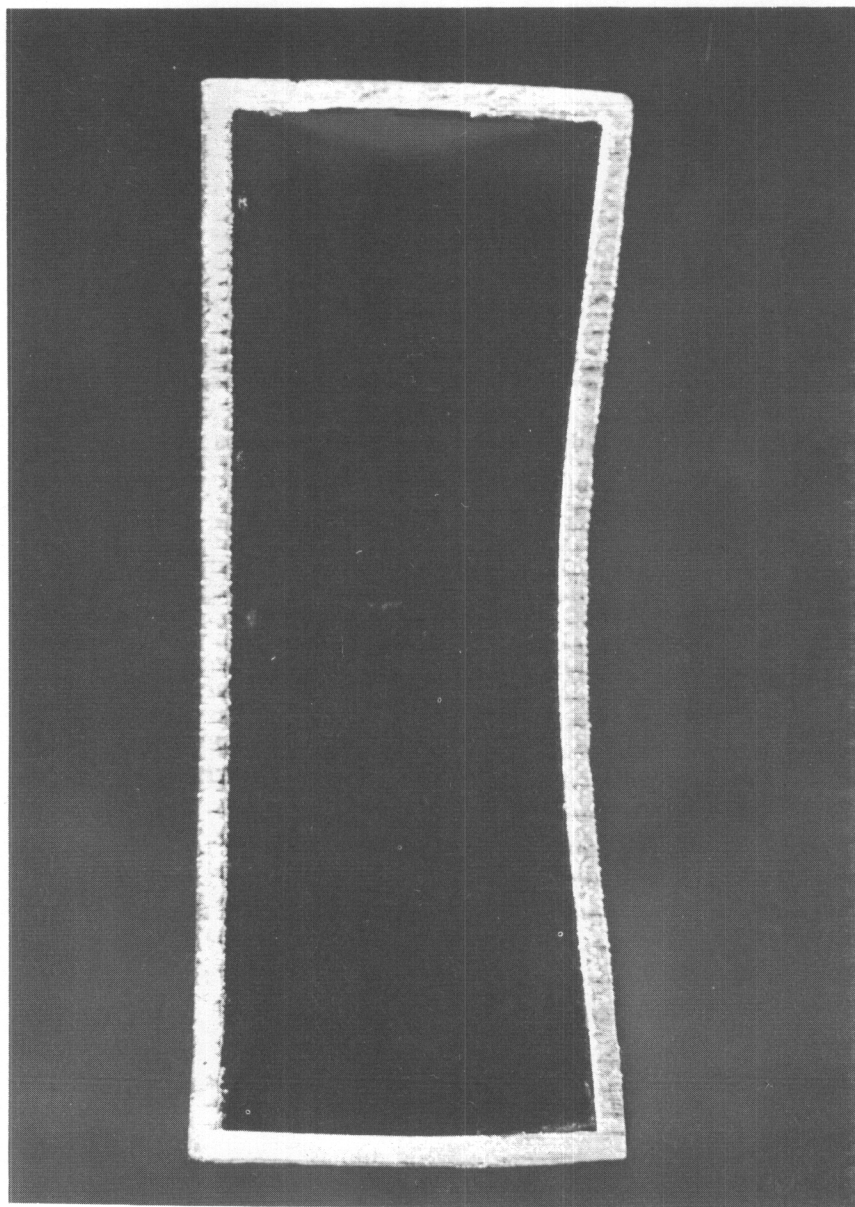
CROSS-SECTION OF LIGHTLY-LOADED BOX-BEAM AT CENTER SPAN
